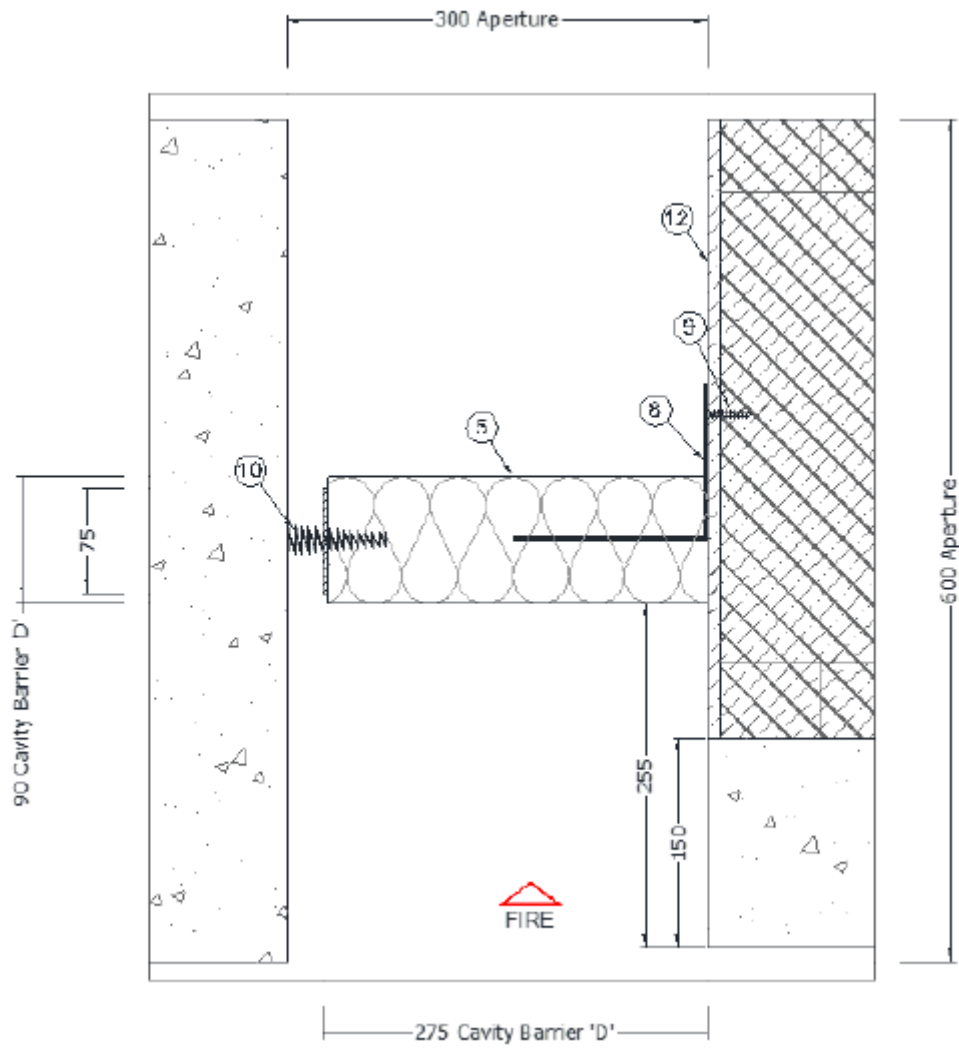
/01:03 – Test report WF407778 Cavity barrier D with inner wall of timber and 9mm OSB facing in a 300mm wide cavity
